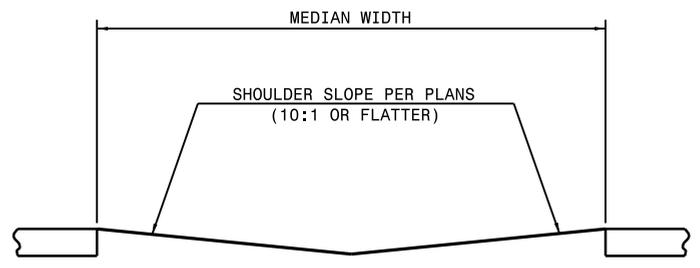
DETAIL OF MEDIAN TREATMENT AT UNDERPASS
